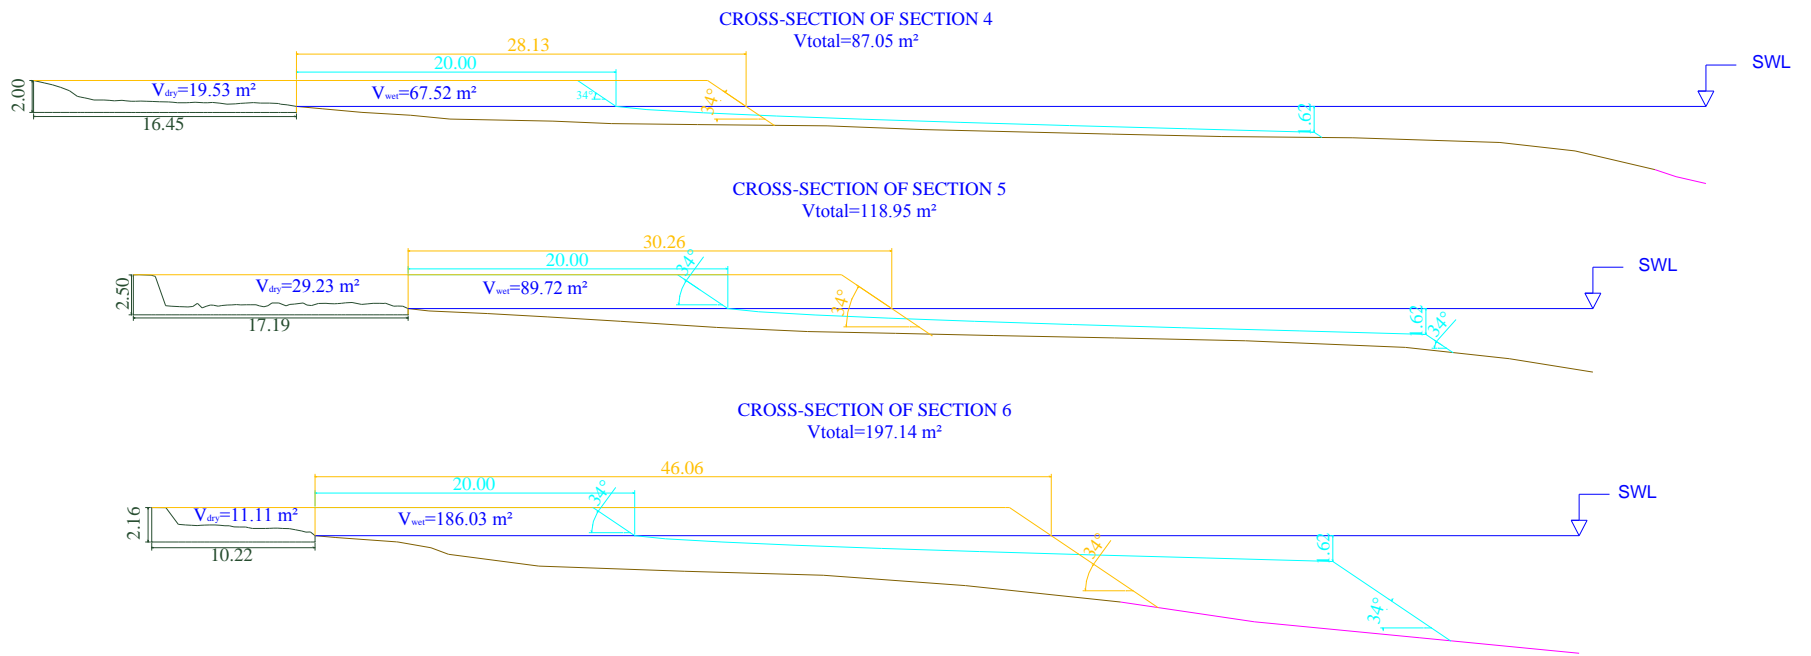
Design profiles of Section 4,5 and 6 for 20 m new dry beach width ($D_{fill}=0.32$ mm).
